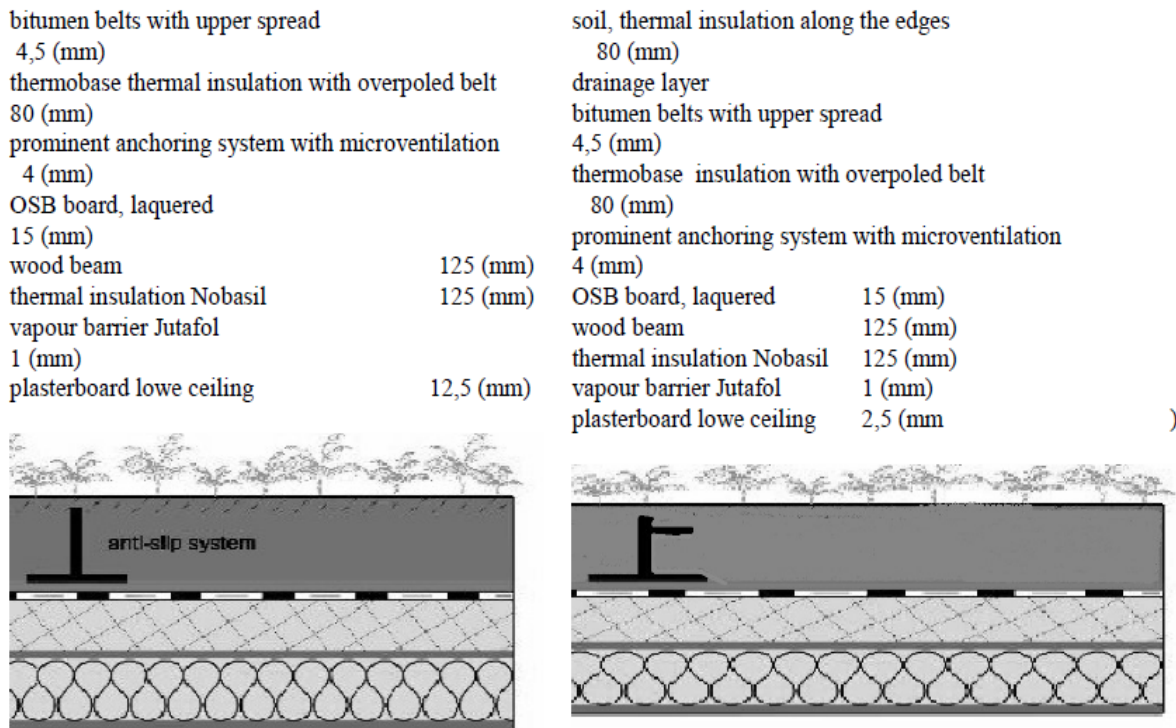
Roof layers' composition    Figure 3: Current roof layers' composition
